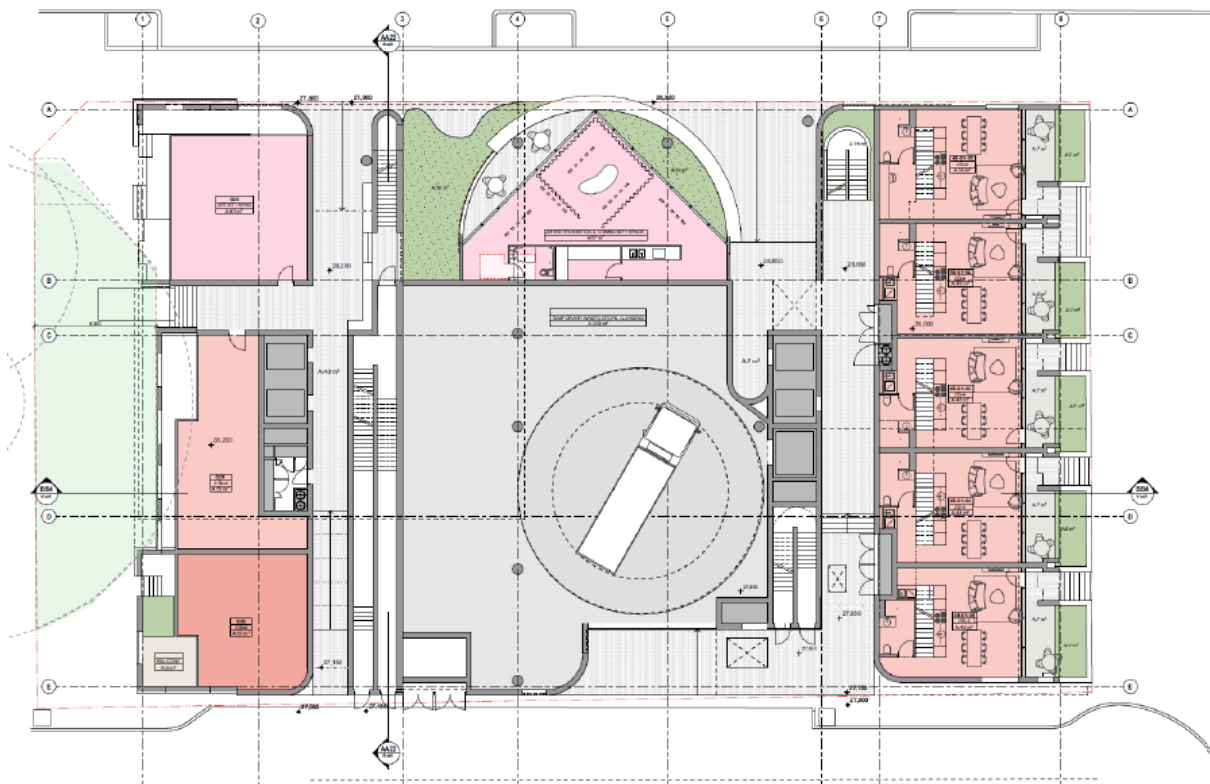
Parcel 4 ground floor plan. Source: Curious Practice 2025
